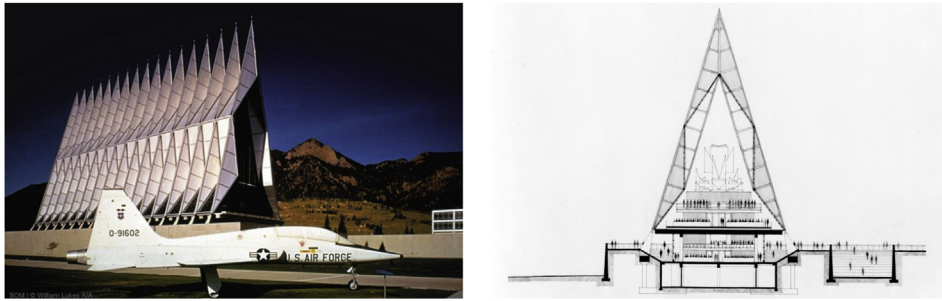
Air Force Academy Cadet Chapel at the Air Force Academy, Colorado—façade and cross-section. Source: Perez (2010).
